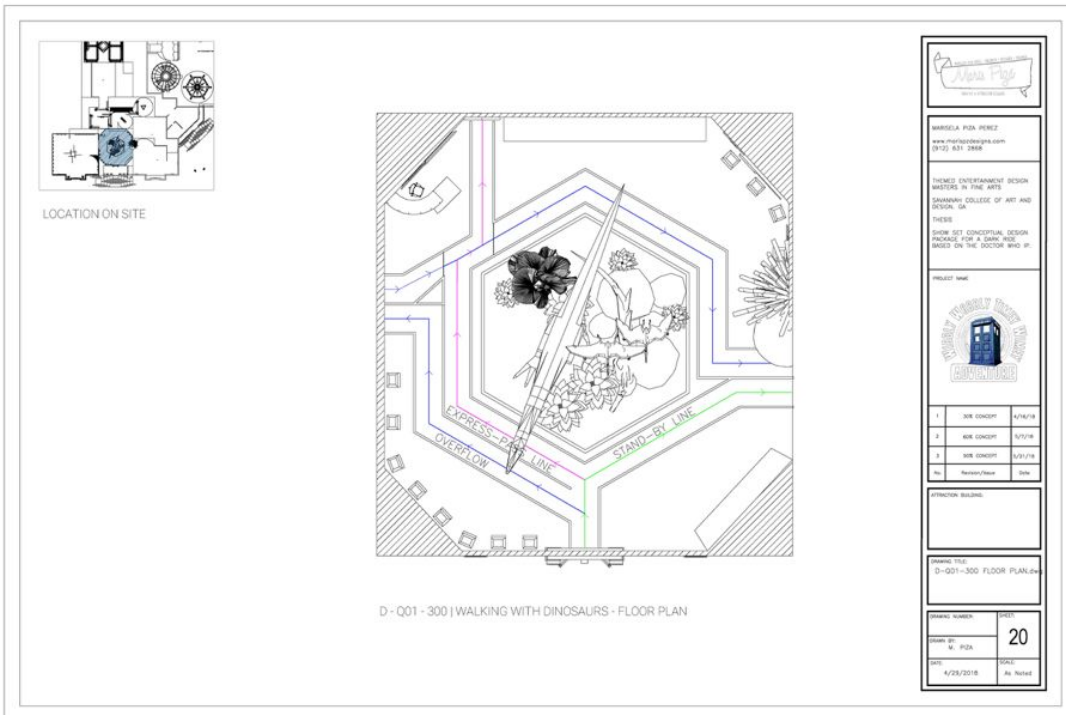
D-Q01-300 | Walking with Dinosaurs - Floor Plan
